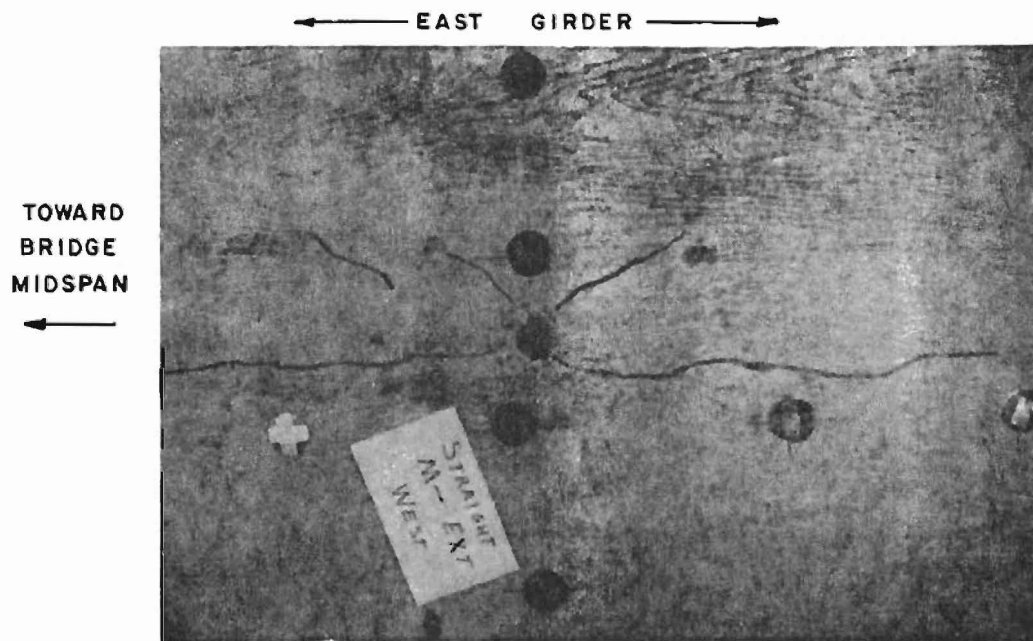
shows cracking in the outside spans of the exterior negative moment tests, and Fig. 5.35 presents crack patterns in both slab spans at the interior straight strand negative moment test location.
